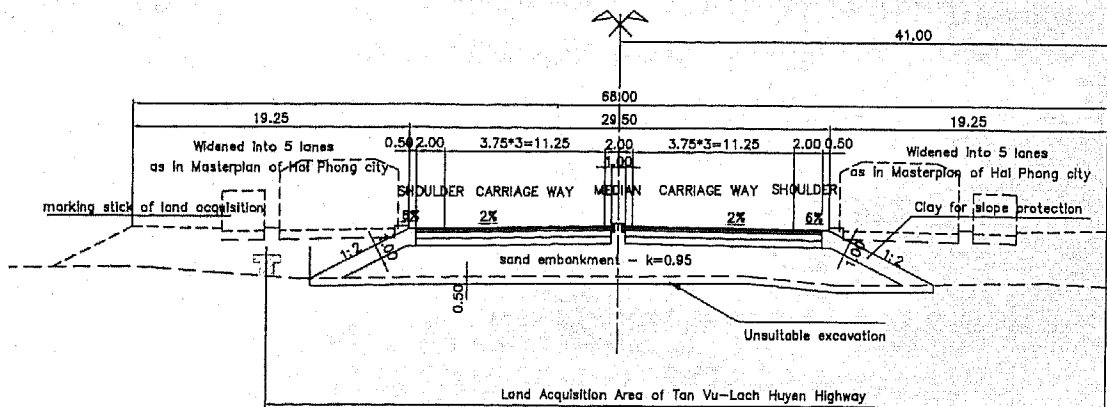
and 2.2.3 show the typical cross sections for the first stage and second stage, respectively. Details for the application of the stage construction are described in Section 2.4.3.
